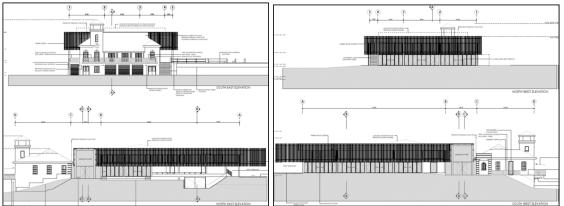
Elevations: Southeast, Northeast. Figure 4 Elevations: Northwest, Southwest.
